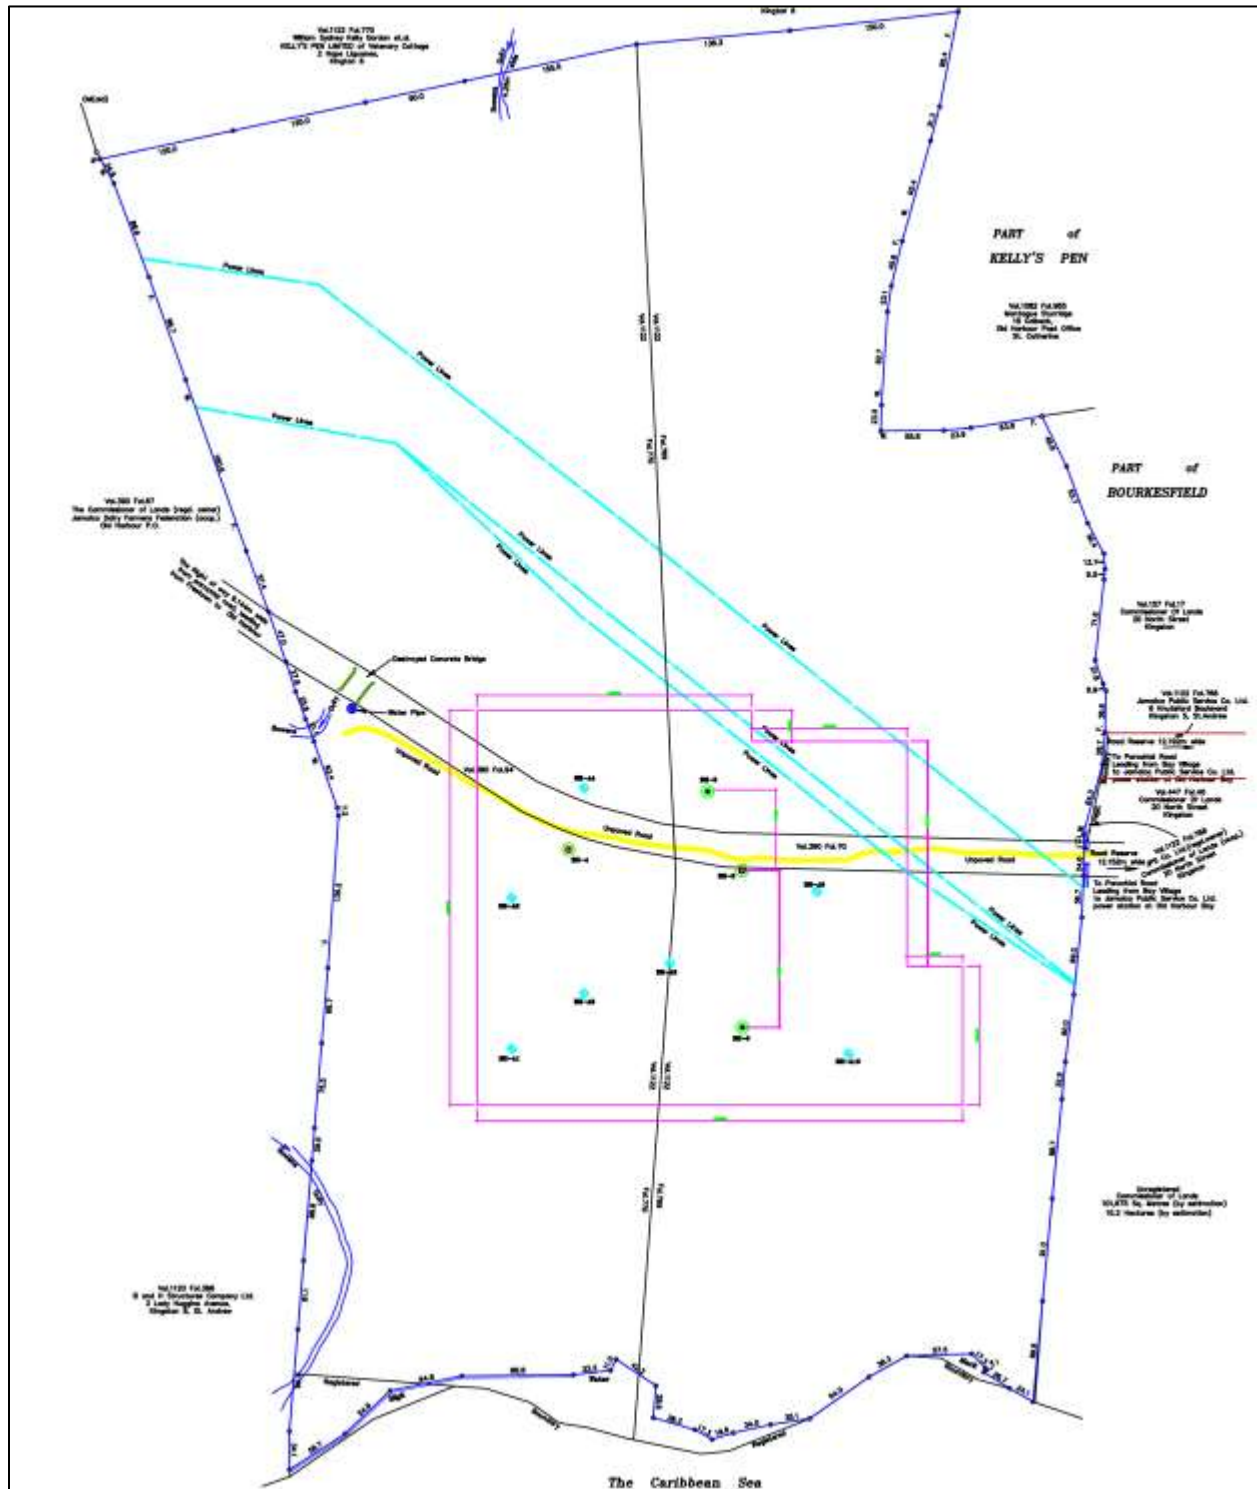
Location Plan for Additional Boreholes – JPSCO
